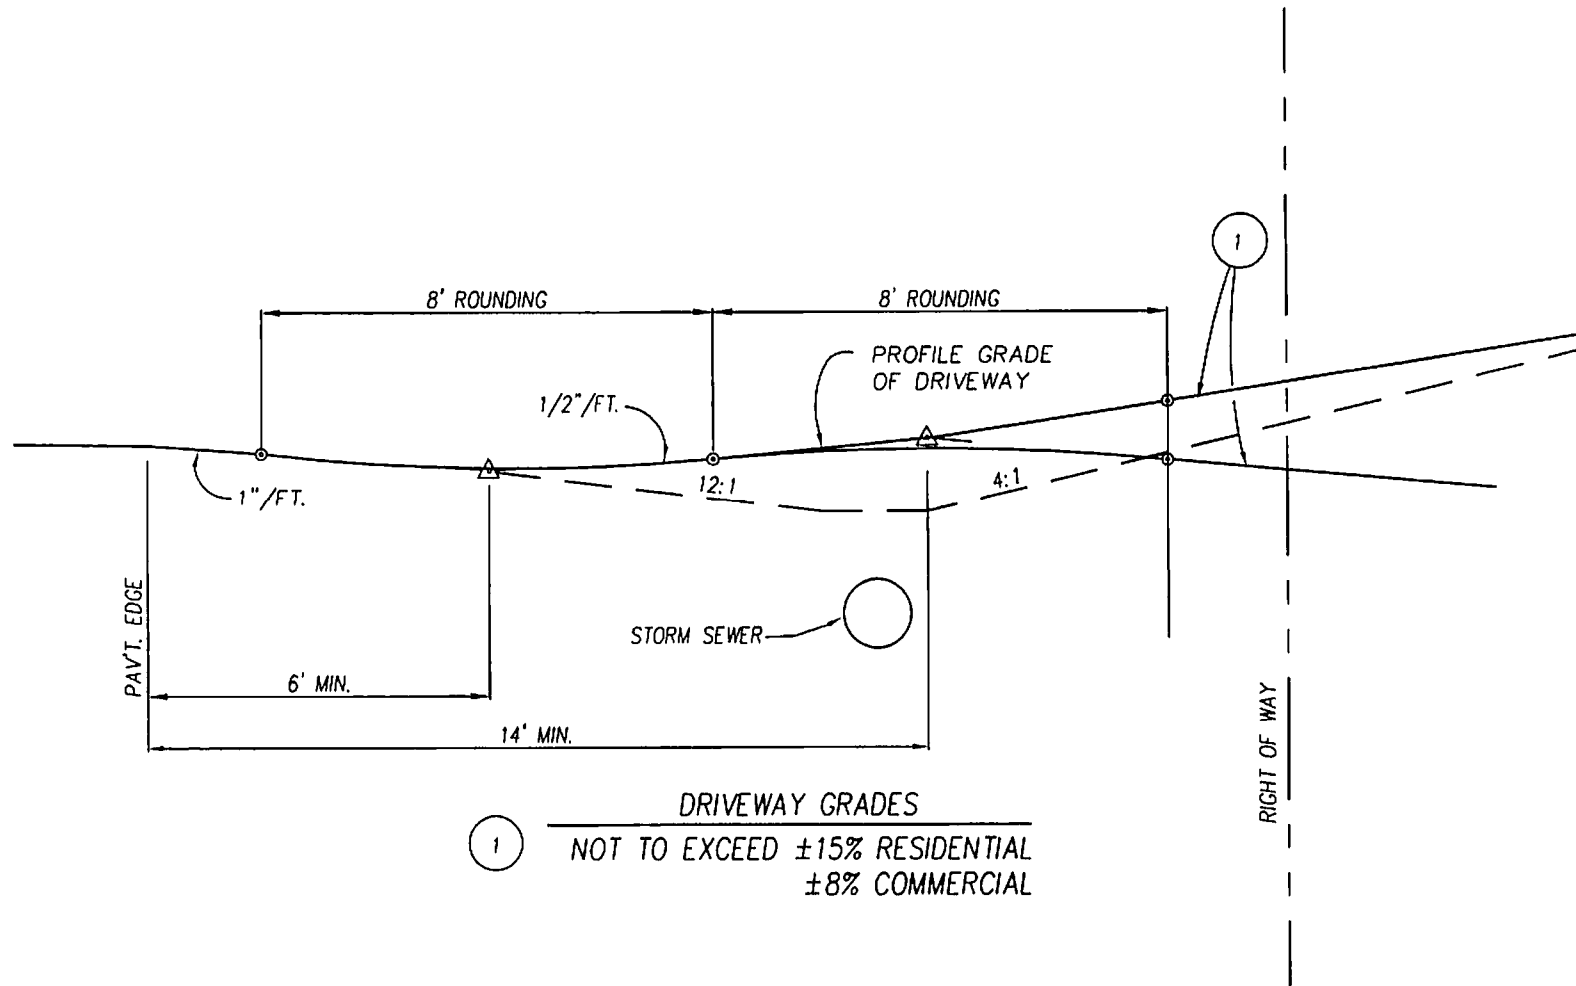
Driveway Profile with Ditches Enclosed
